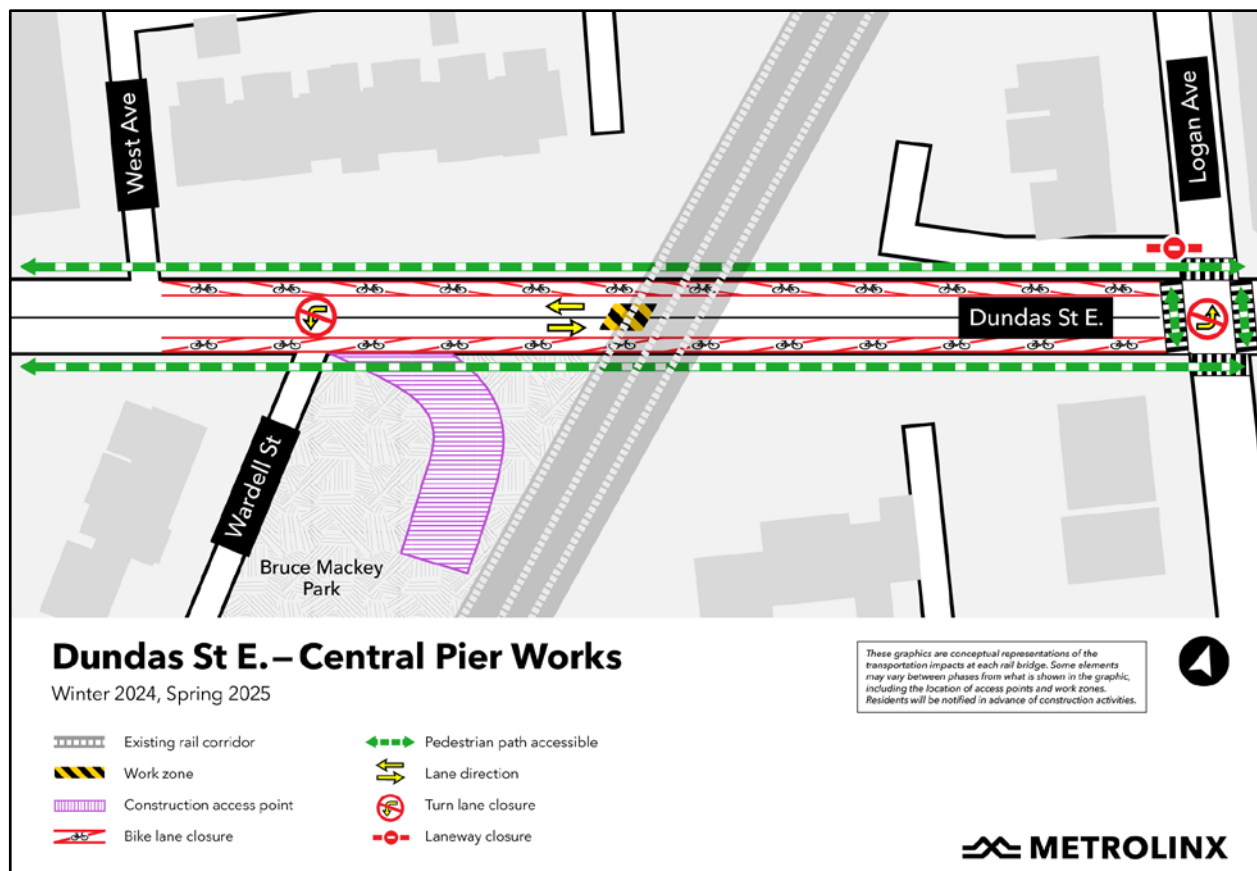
Dundas Street Traffic Management during Bridge Centre Column Works
